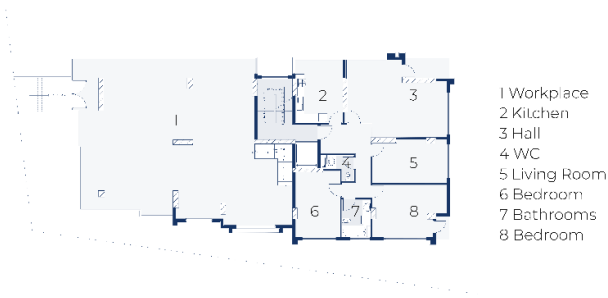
Nursel Kaymakçı Apartment Ground Floor Plan.
